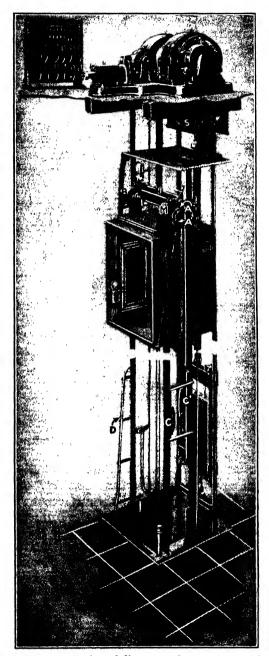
Complete installation of direct-traction machine with micro drive.
